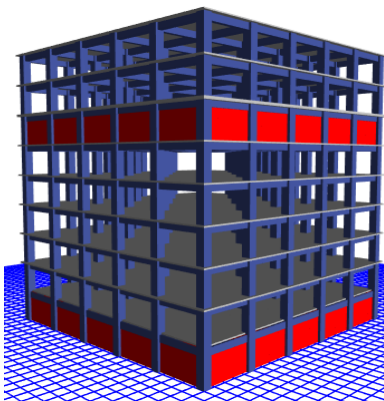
Model 7 (3D View of the RC wall in sixth storey)
